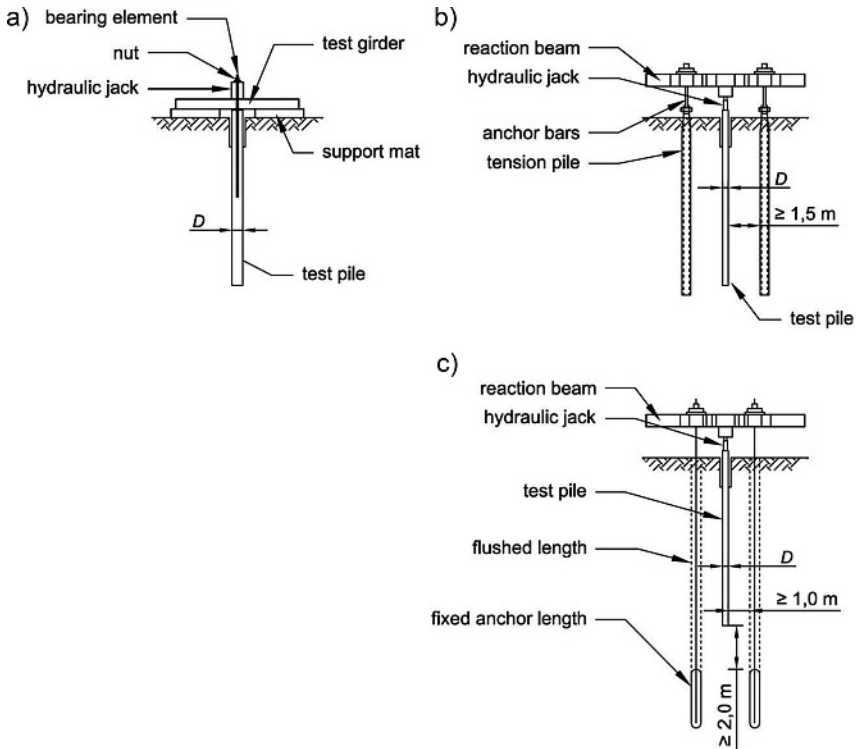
Micropile load tests: minimum spacing between the loading system and the test pile a) tension pile, reaction system formed by test girder on support mats b) compression pile, reaction beam anchored by parallel tension piles with load transfer along their full lengths c) compression pile, reaction beam anchored by parallel ground anchors with deep fixed anchor lengths
